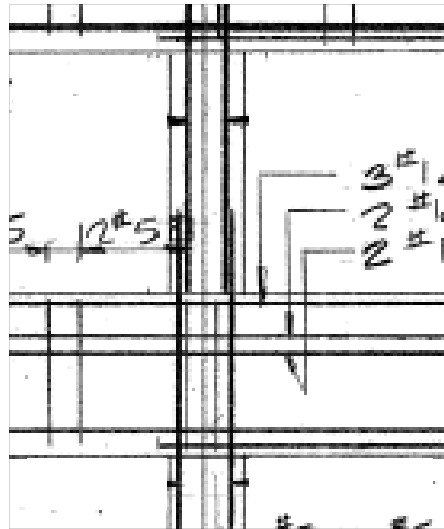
Short lap splice located on the bottom of columns in basement and 1st story.
